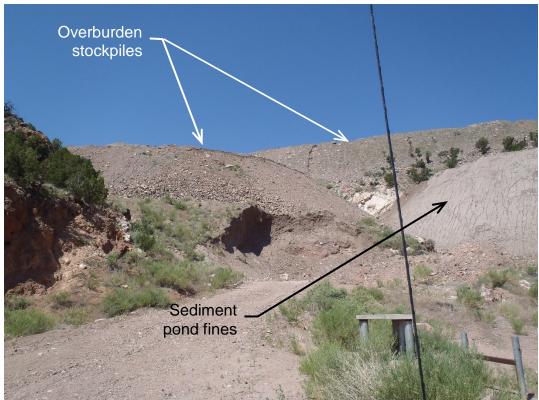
Overburden & sediment pond fines stockpiles (north end of phase 1, looking west).
